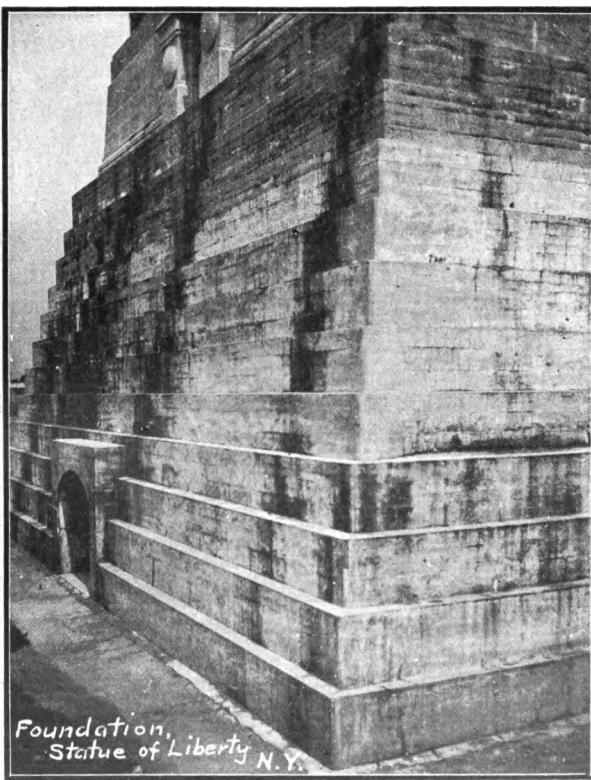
Concrete Foundation Statue of Liberty, New York Harbor.
